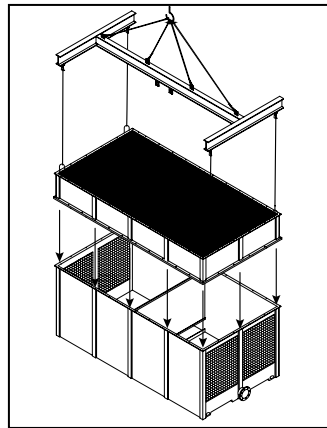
Lower body section assembly for a modular tower (RTGMTC-G & RTGMTC-H)
